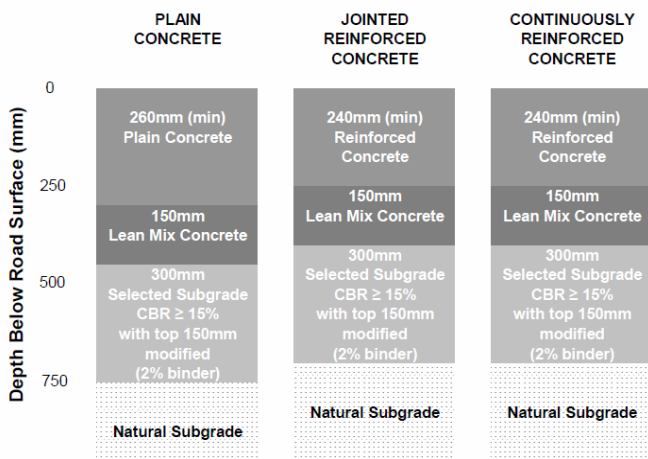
Typical Heavy Duty Rigid Pavement Configurations Used in NSW [5].
